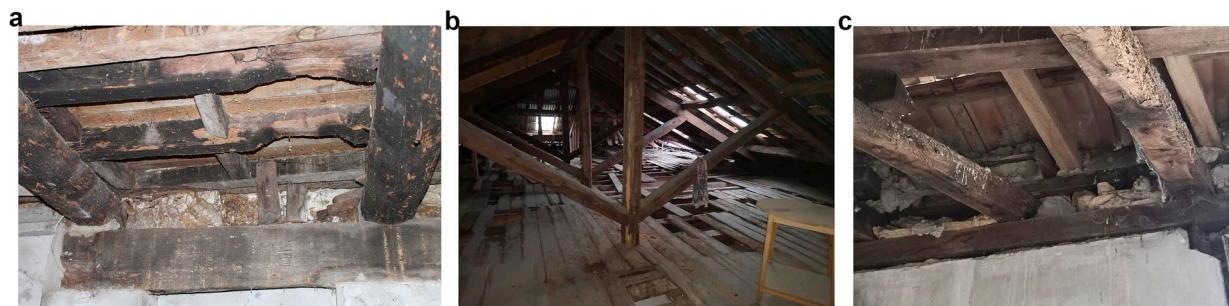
(a) Example of a two-order timber floor with connection to the perimeter wall; (b) timber king post truss of a roof; and (c) mixed masonry-timber perimeter ribbon of the roof.
